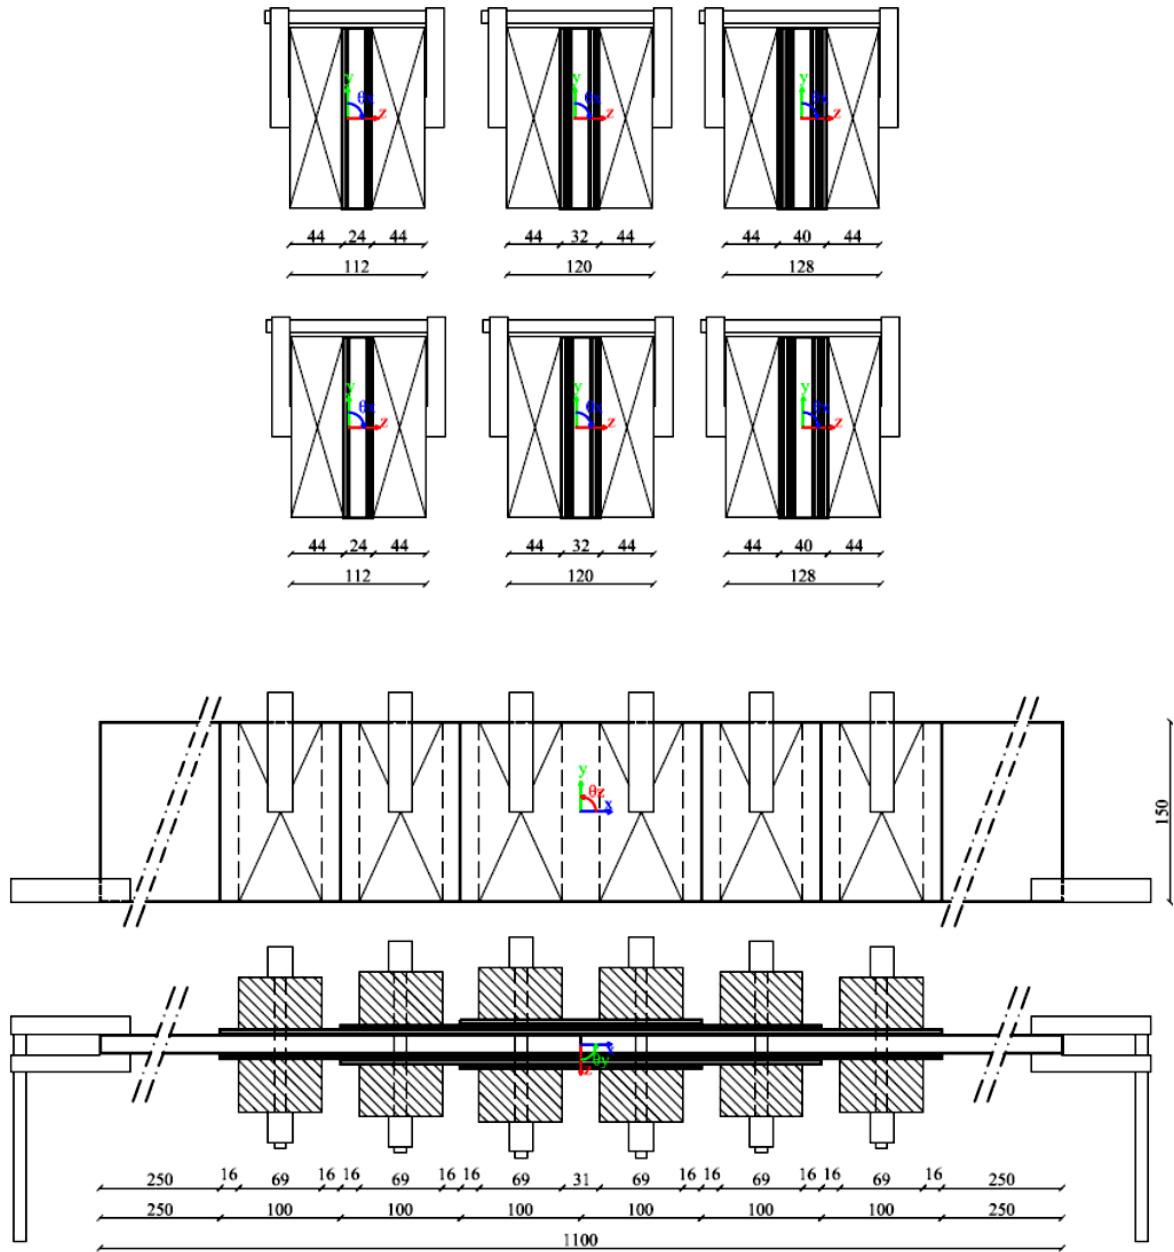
Bonding of straps to plates; front view, side view and top view
